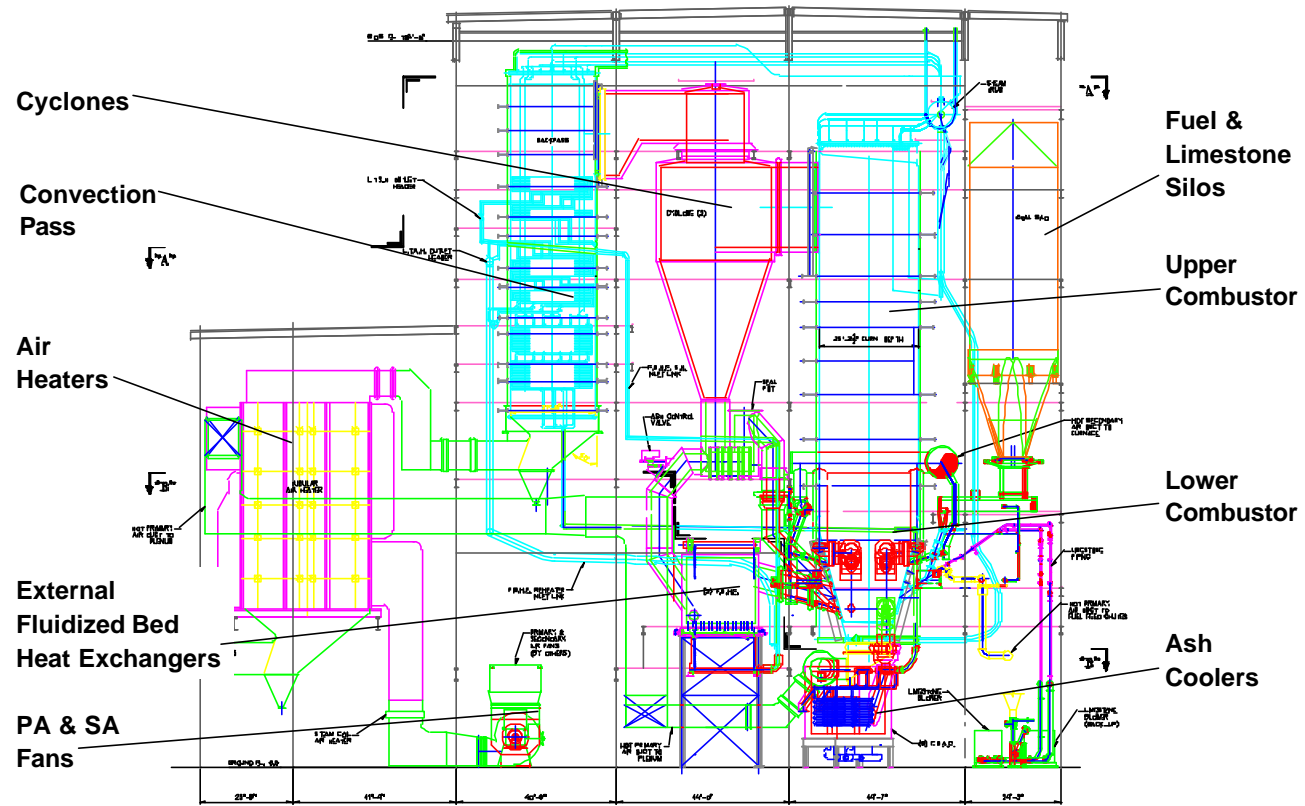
2: Case-1 Boiler Island General Arrangement Drawing - Side Elevation of Nominal 210 MW-gross CFB Steam Generator
